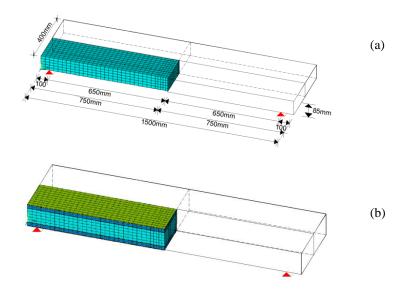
(a) Schematic arrangement and geometry of control specimen and (b) model for specimen 2iMi2.
